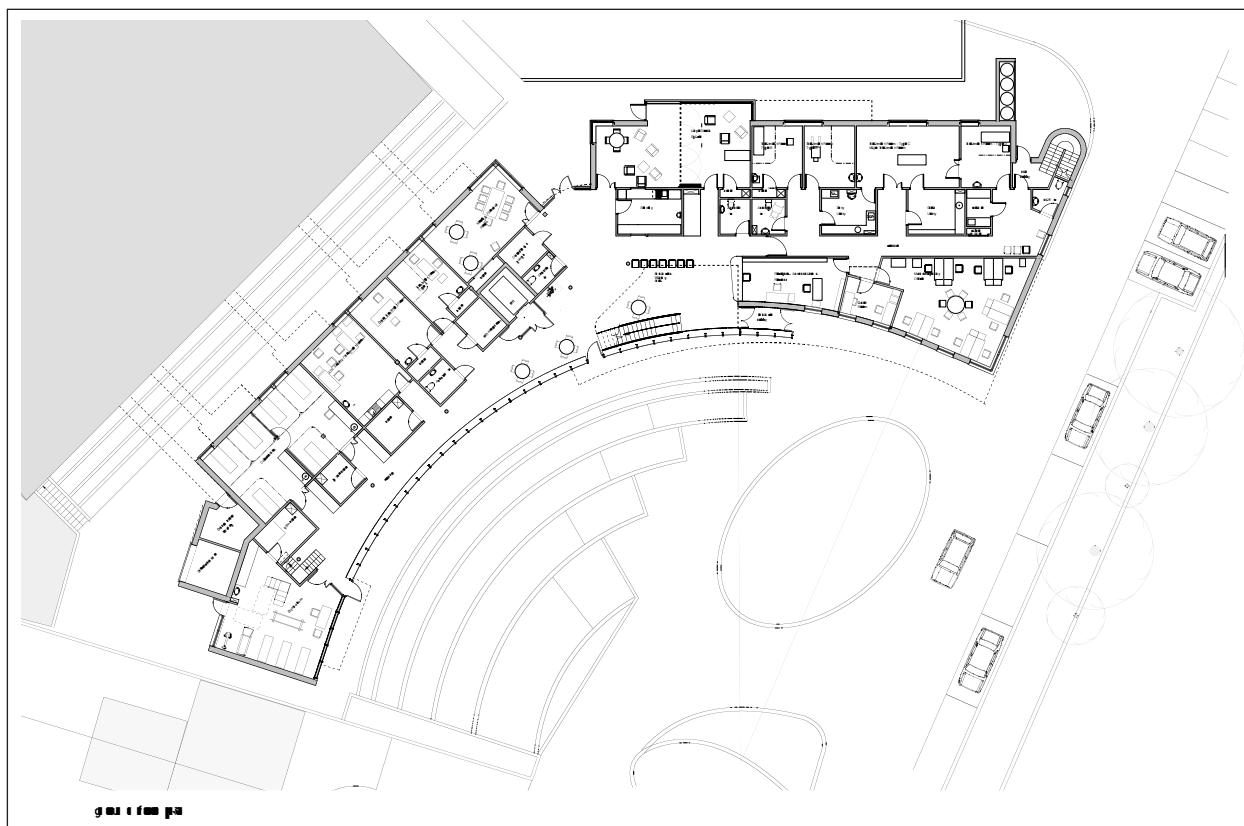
Pulross Intermediate Care Centre, ground floor plan
